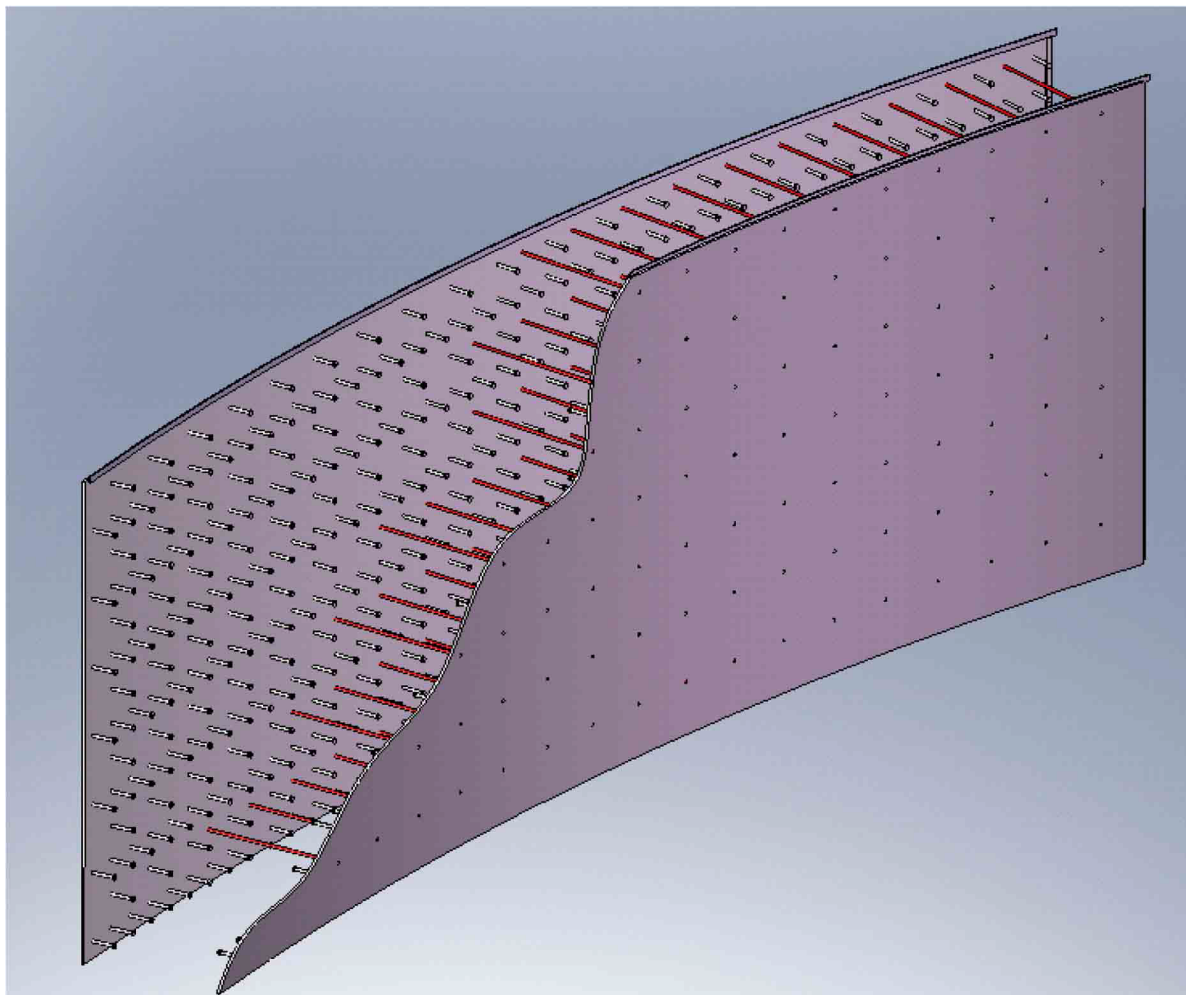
H.5-13 Enhanced Shield Building Wall Panel Layout
